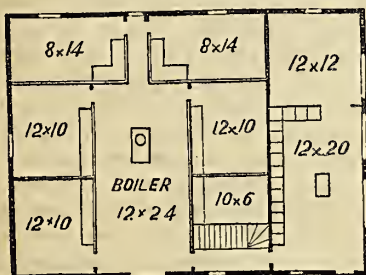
PIGGERY AND HEN-HOUSE—FLOOR PLAN.
